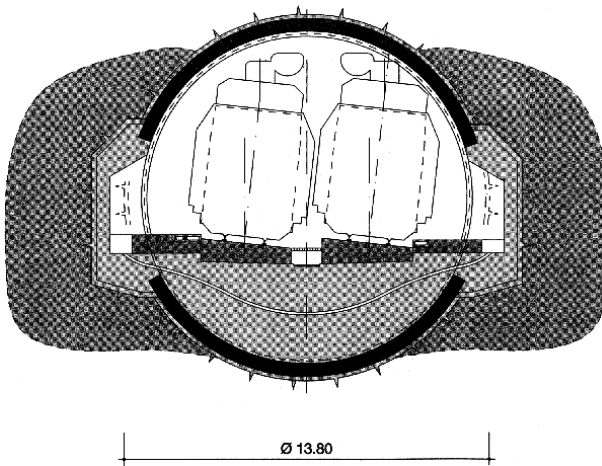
Cross-section with safety niches – shield tunnelling.
